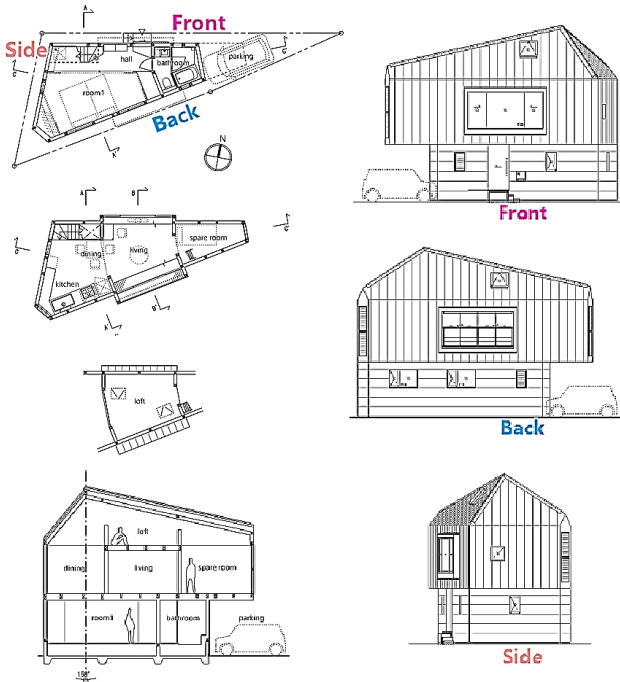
Design of a small triangle wooden house in Tokyo, Japan [12]
